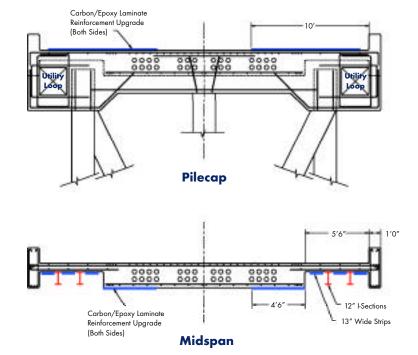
Cross Sections of the Reinforced San Diego Pier 12 at the Pilecap<sup>\*</sup> and at Midspan Between Pilecaps.
